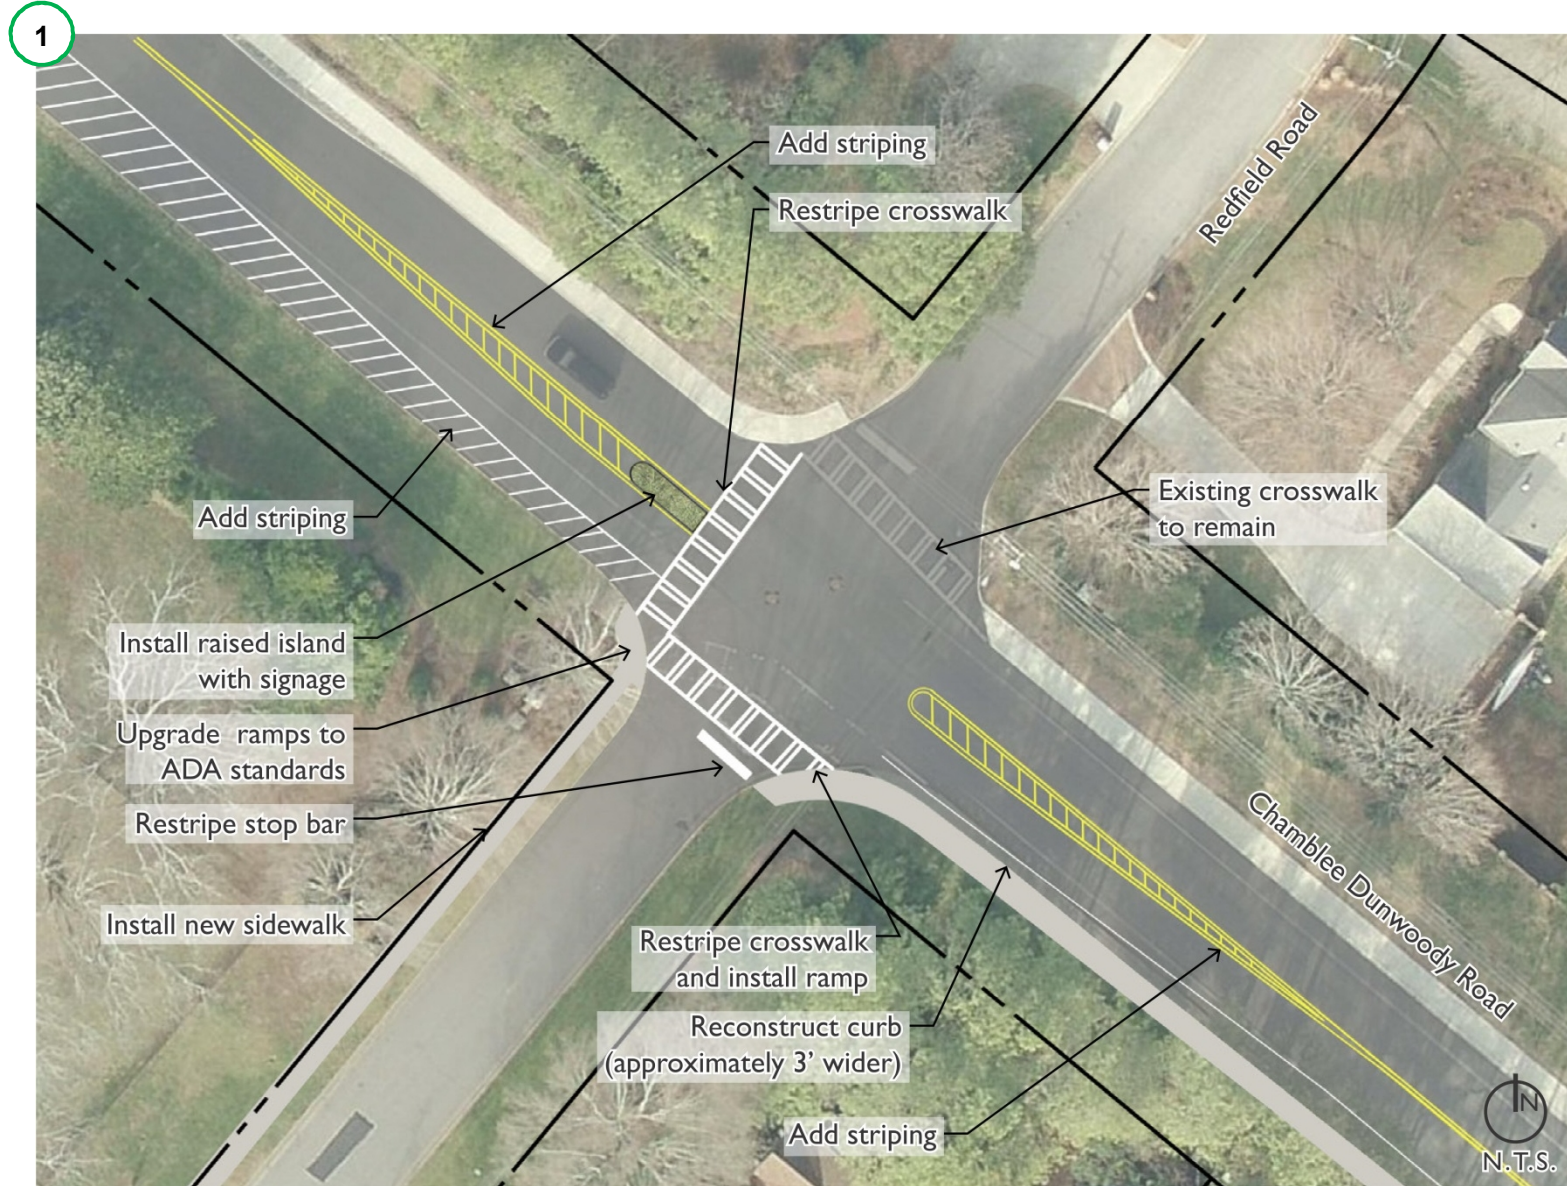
Chamblee Dunwoody Road at Redfield Road Concept
